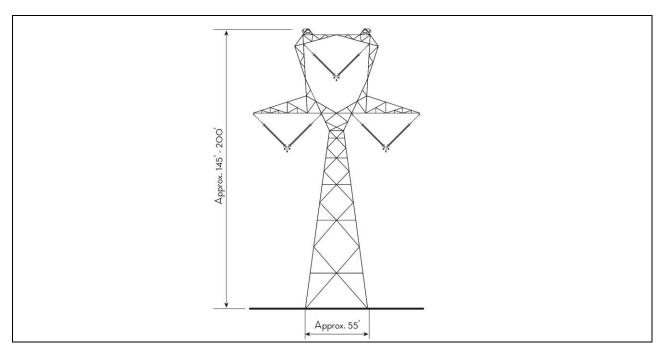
Proposed Tangent Single-circuit 500-kilovolt Lattice Steel Structure (Delta Configuration)
